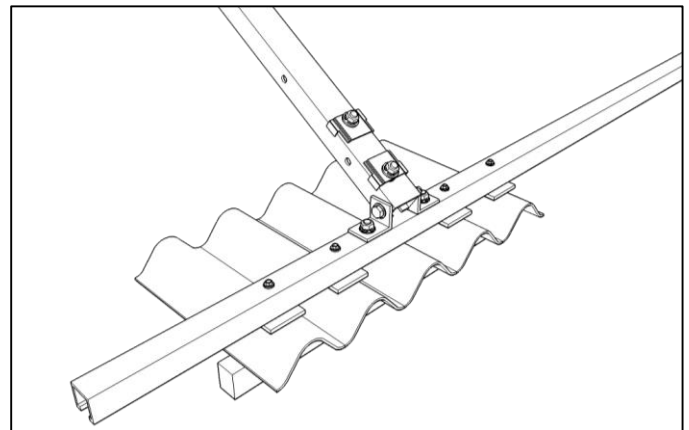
Close-up of front track connection to roof rail, and fixings on peaks of tin roof equidistant from front track.
